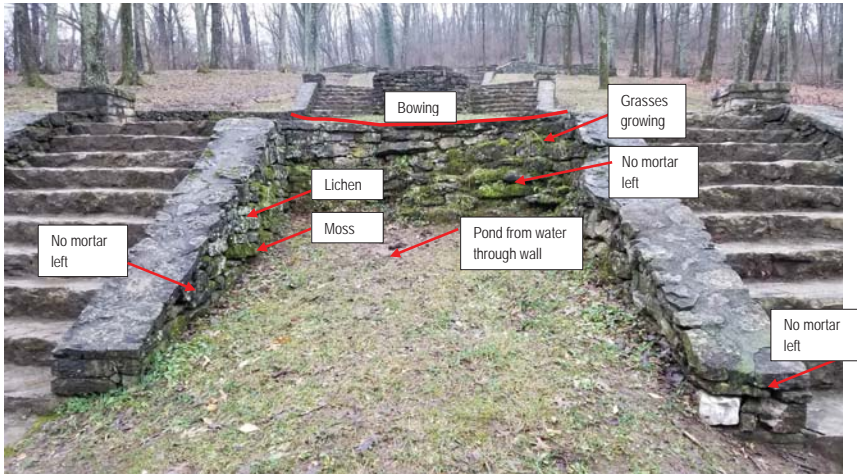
Retaining wall to be rebuilt. All mortar has washed out, wall is displacing. This portion of the wall needs to be reset.
